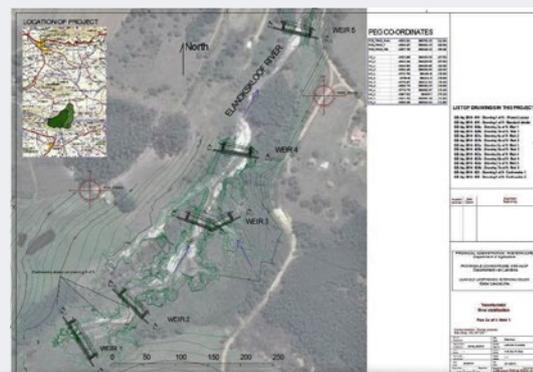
Shown above is the plan of the site indicating where the gabion weirs were constructed.
